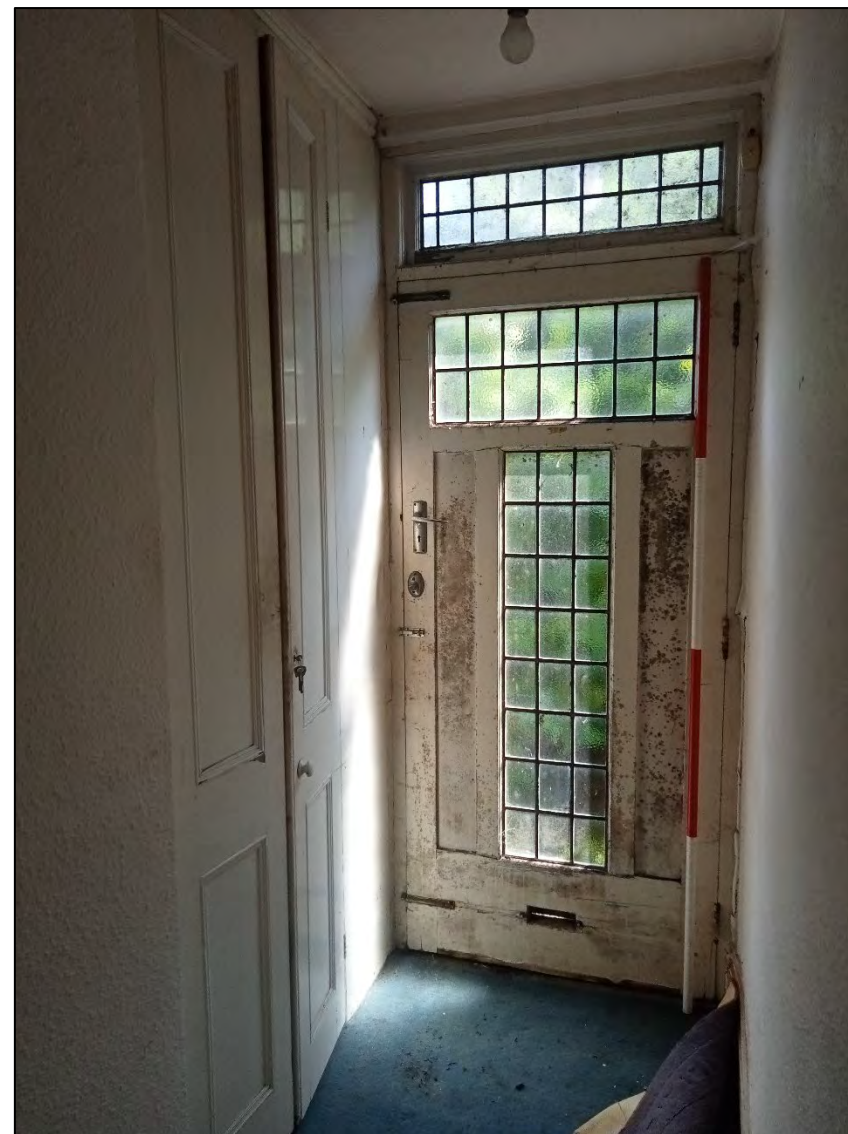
Corridor Room 11, looking north-east. Scale 2m.
